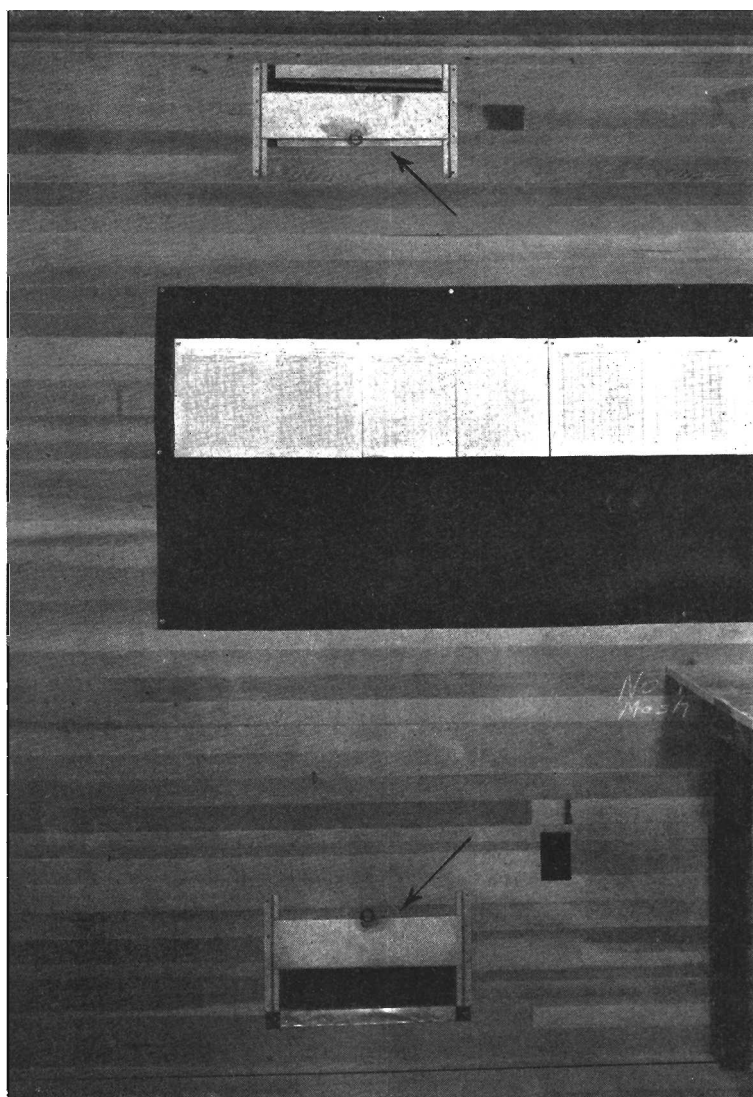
View of side wall of battery brooder room. Arrows point to ventilation outlets with sliding door to control size of opening near the floor and near ceiling. The upper outlet should be used in warm weather and the lower outlet in cold weather.
